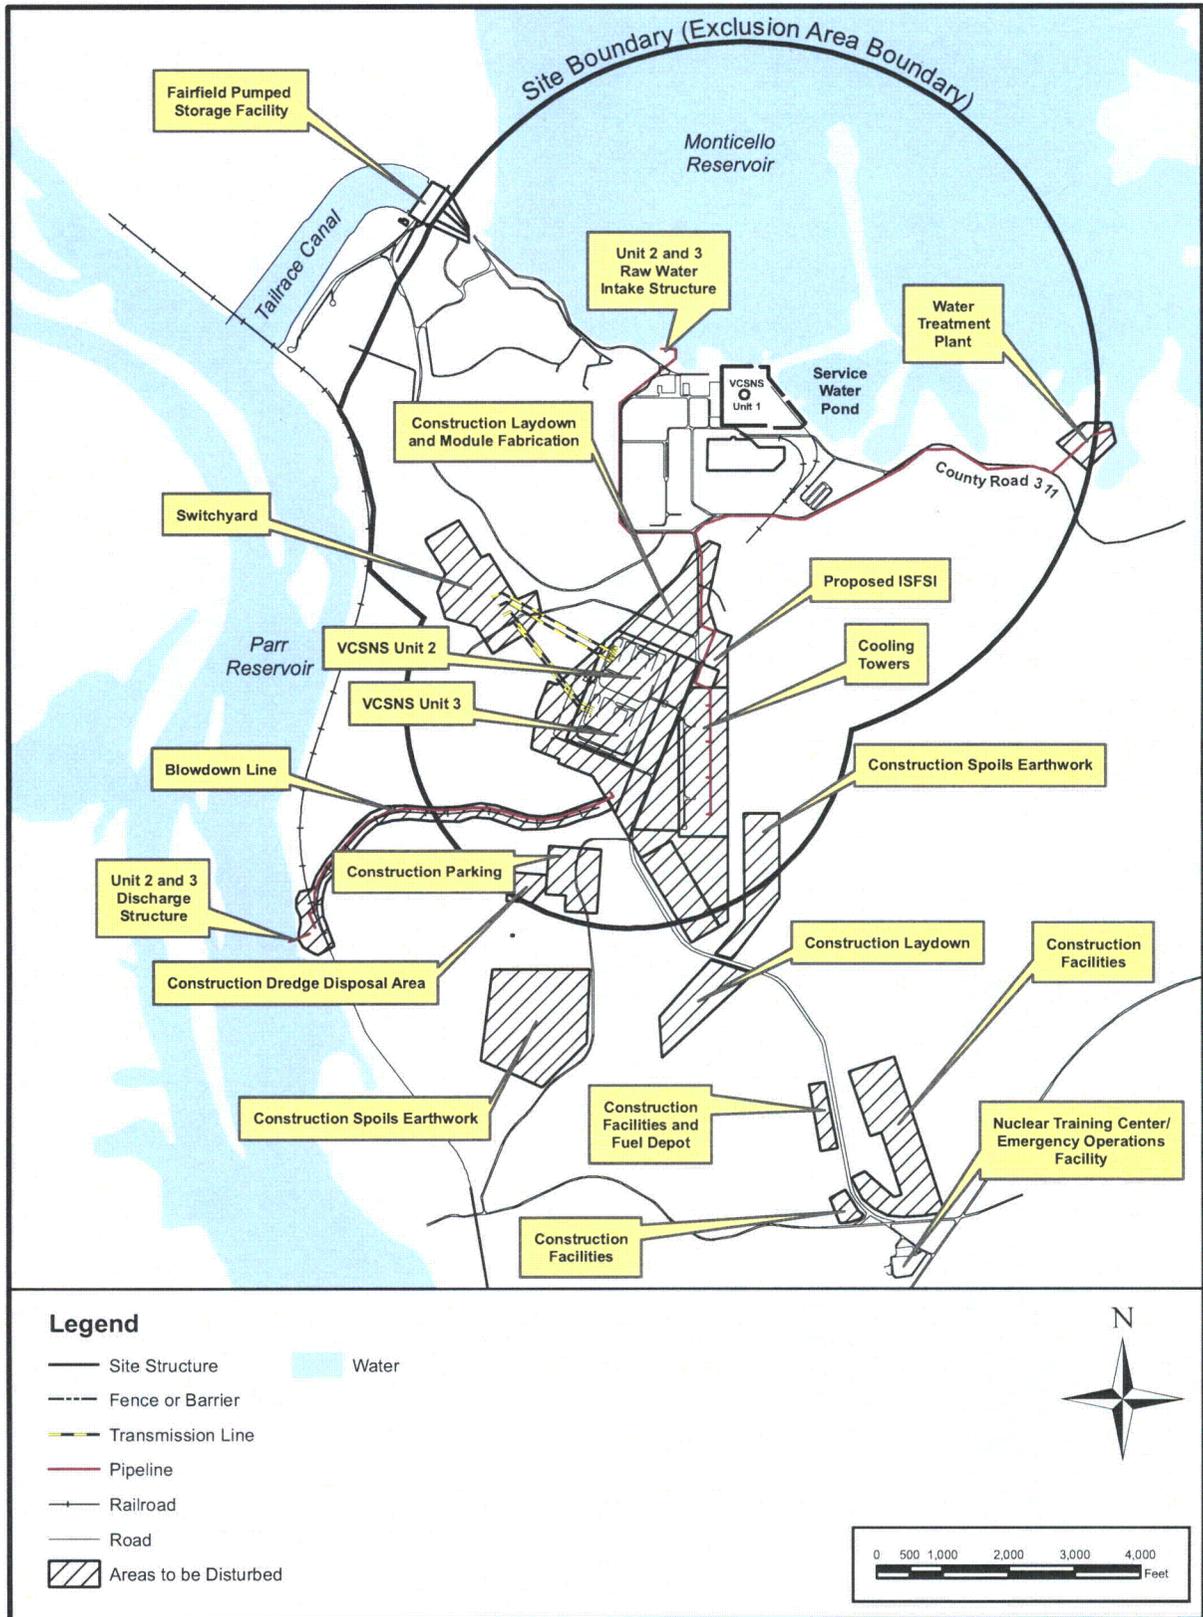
VCSNS Site and Proposed Plant Footprint
